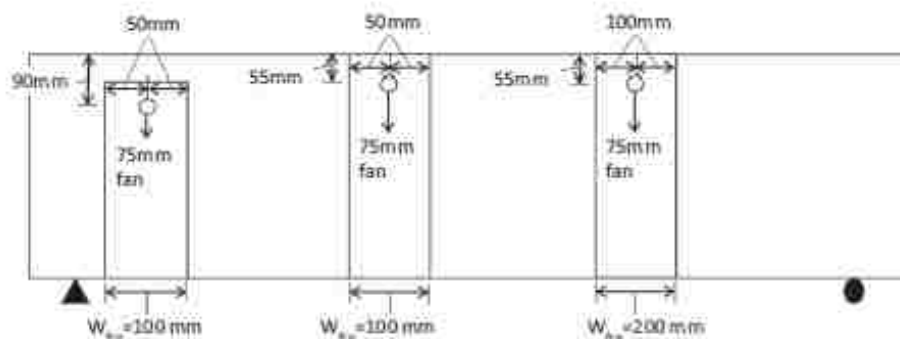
Anchor details for specimens used by Baggio et al. (2014)
